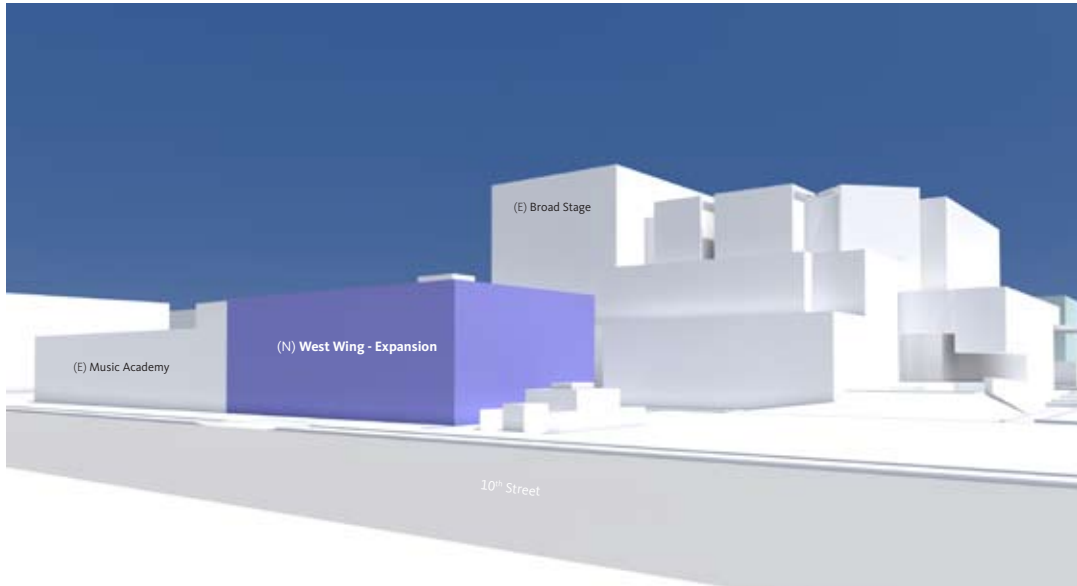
Massing Envelope - West Wing Expansion - SW Pedestrian View
